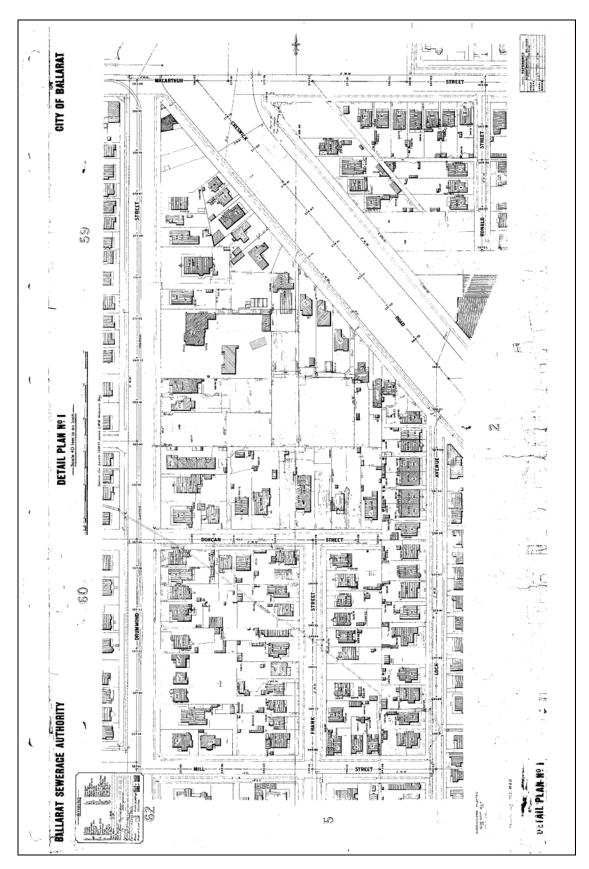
Ballarat Sewerage Authority Plan, 1922. Source: Planning Department, City of Ballarat.
